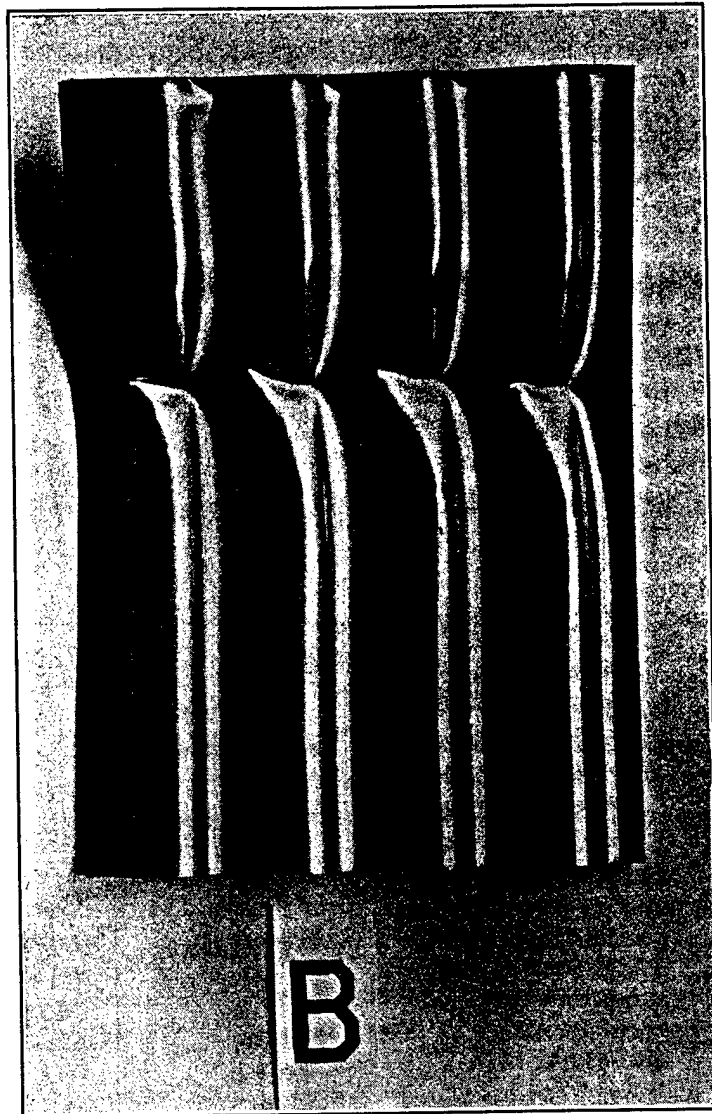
Column Failure of Corrugated Sheet with Flat Sheet Attached.
